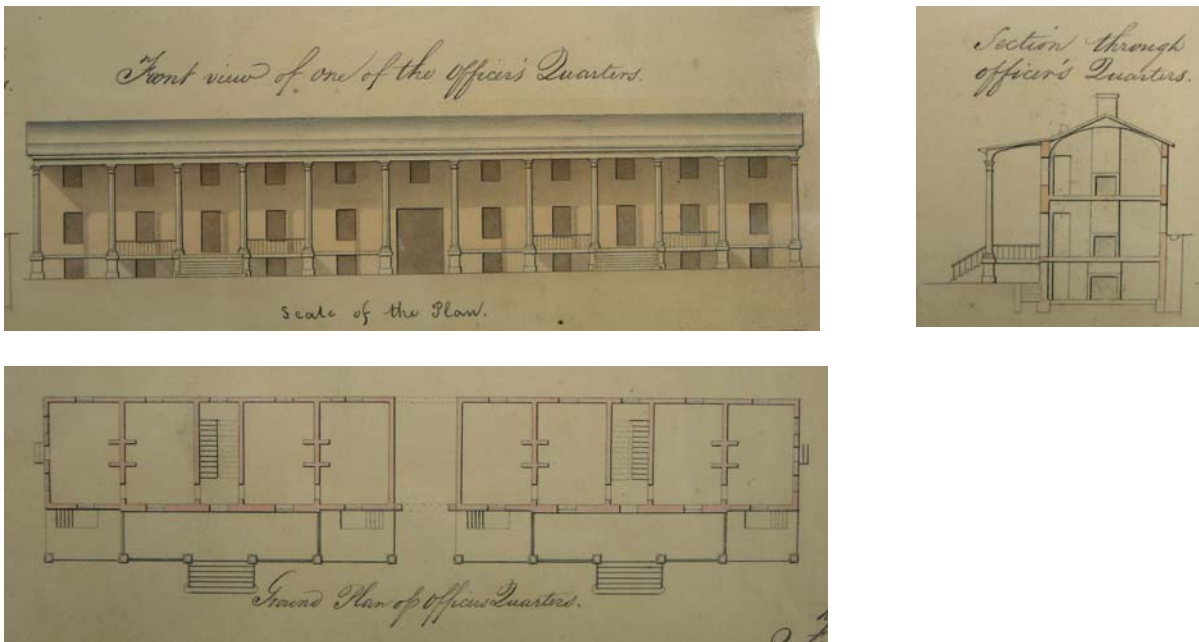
Front view, section elevation, and plan of proposed new Officer's Quarters at Fort Columbus, October 17, 1832.
